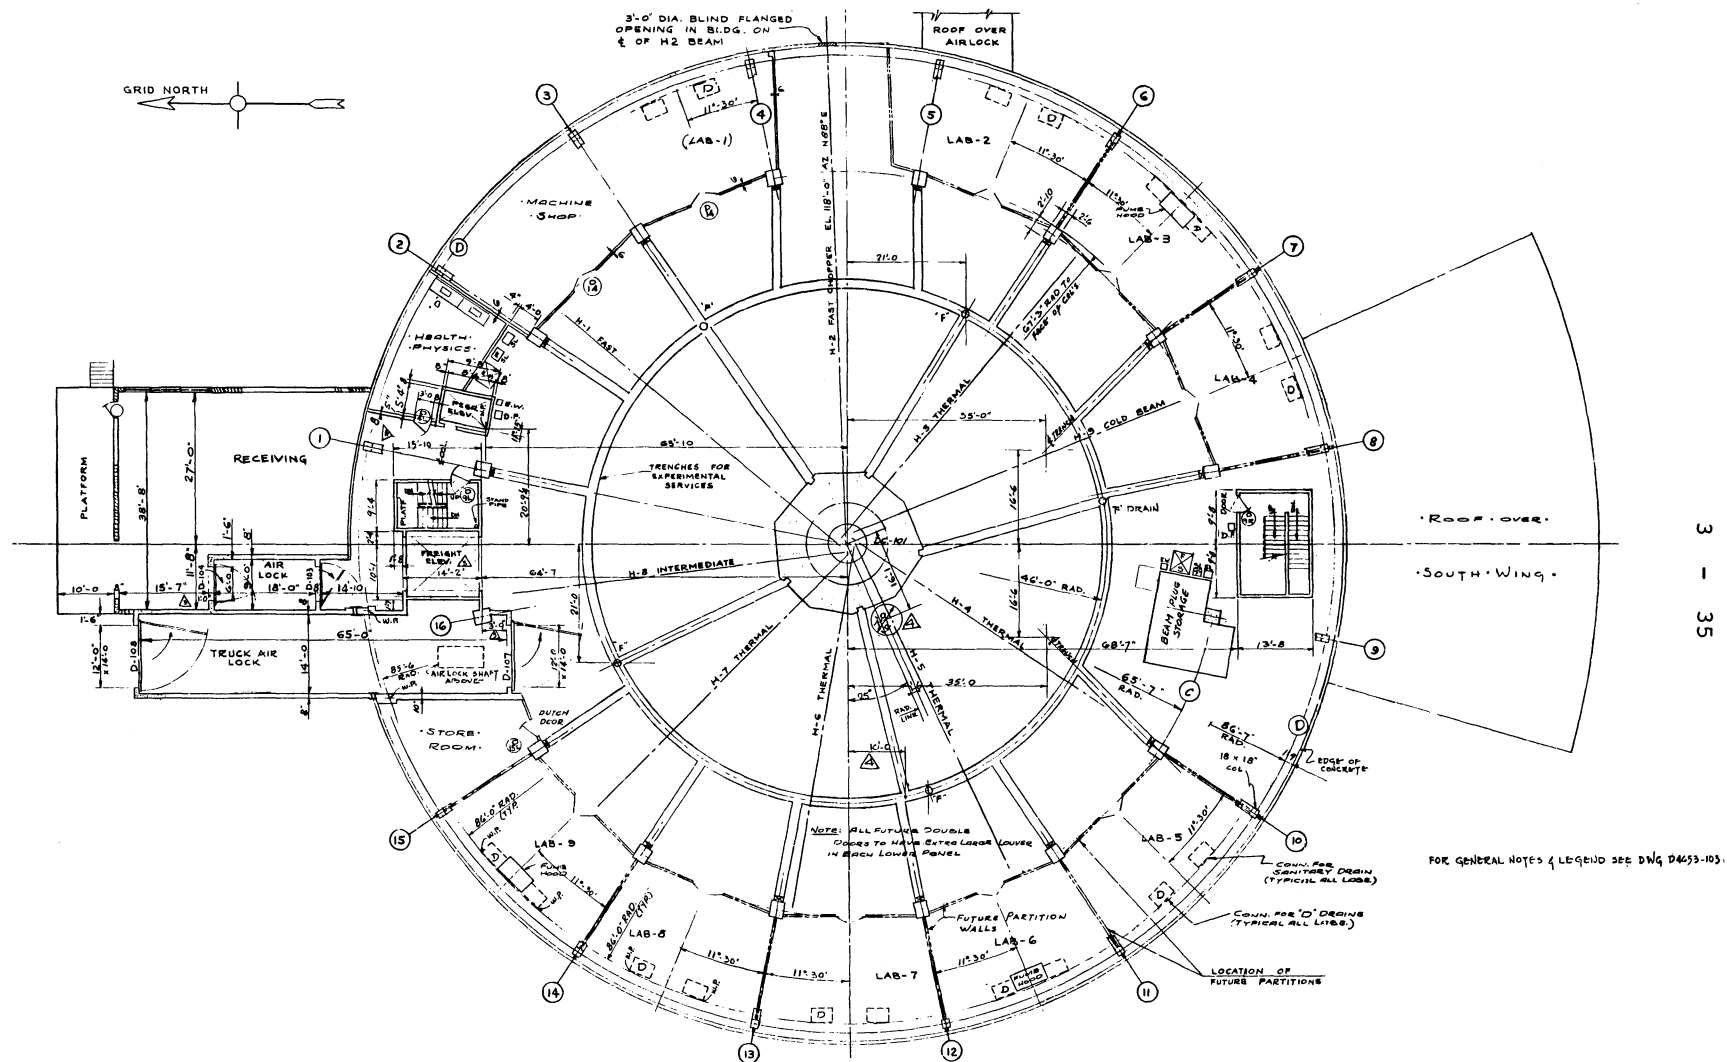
Plan of the experimental level of the HFBR building at elevation 113 ft-6 in.
